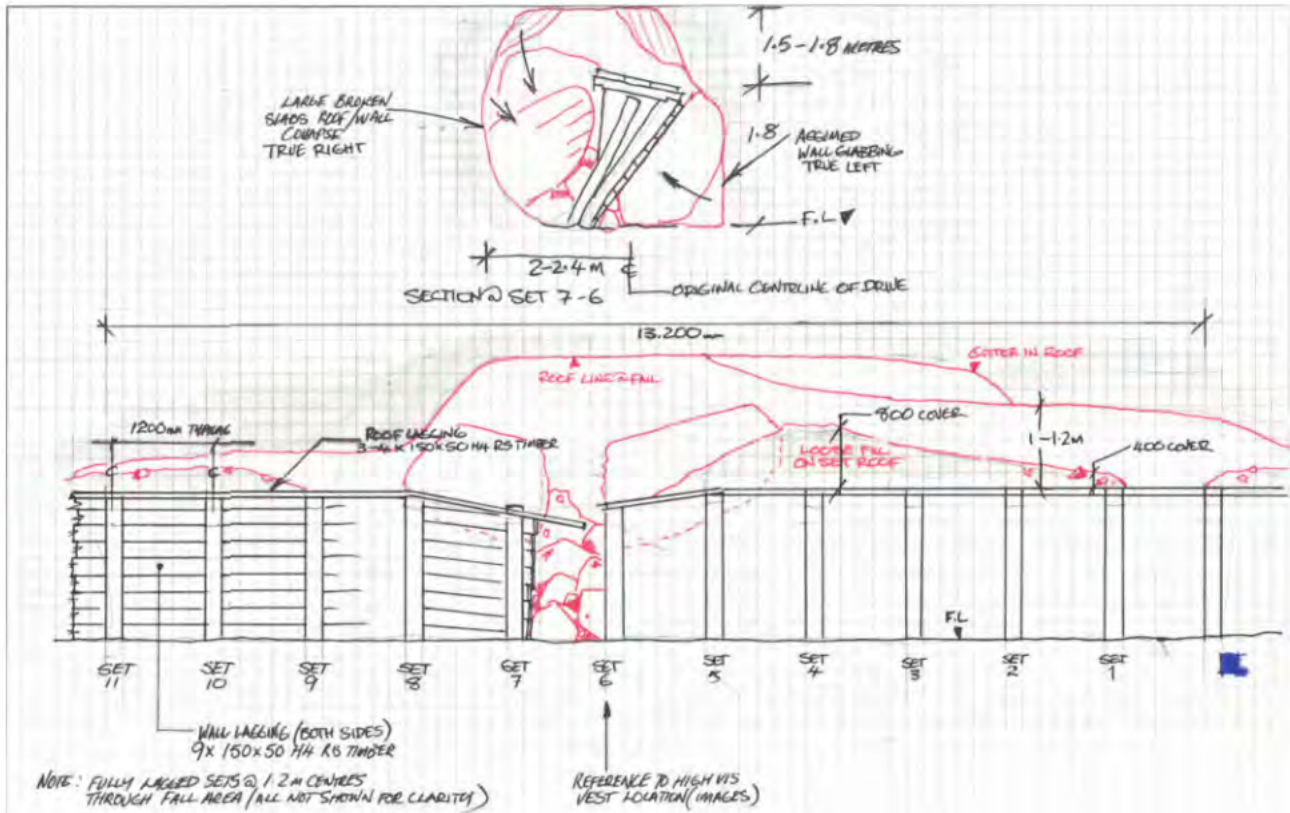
Long section sketch along the fall section of Tunnel 1, showing timber sets and cavity above roof of timbers.
